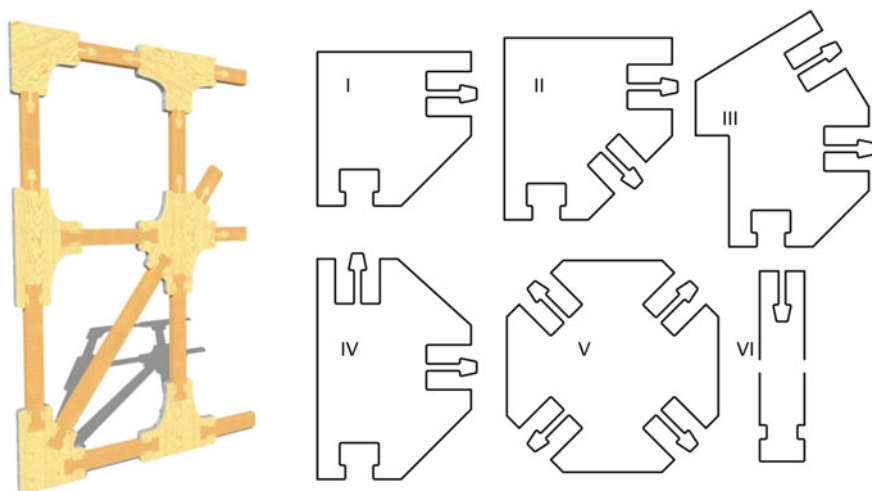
The Makerjoint concept. (a) Sketch of a plane wall assembly, and (b) examples of nodes: I+II—corner nodes, III—roof node, IV—multiple floor node, V—bracing node, VI—Makerjoint beam (Rebstock et al. 2015)
